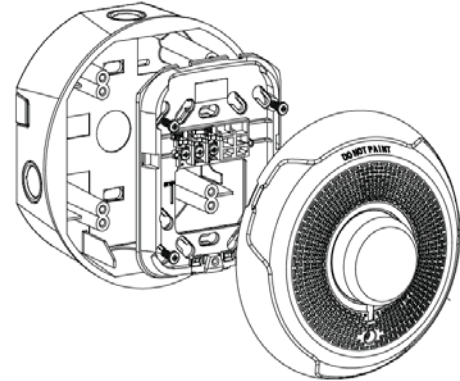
2-Wire Ceiling Mount Horn Strobes with Ceiling Surface Mount Backbox
